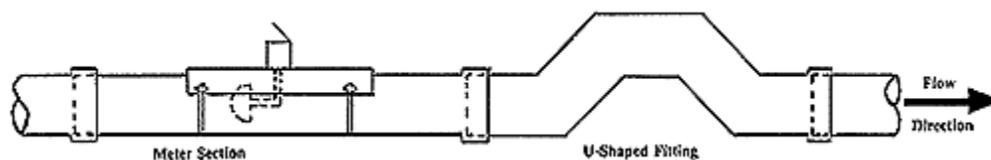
U-shaped fitting installed to guarantee full pipe flow in the meter section.
